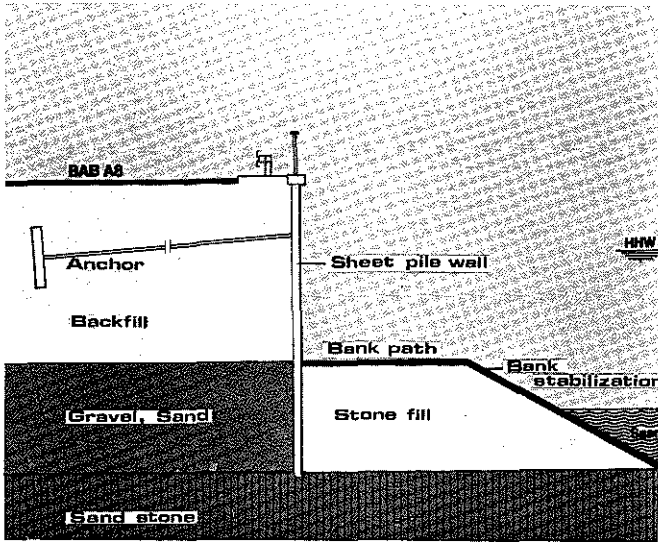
Retaining wall Fremersdorf, cross section, sheet pile wall
